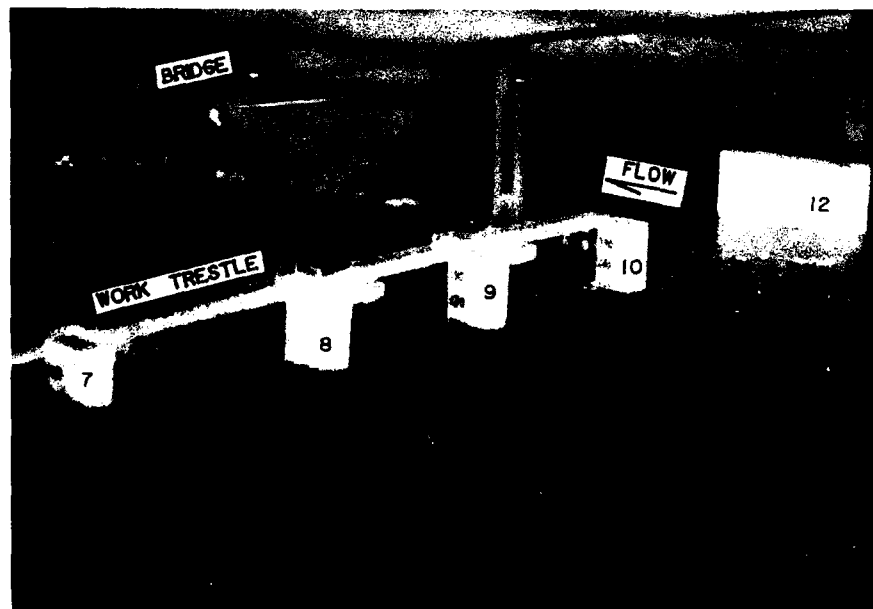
The model for Test 1 on 22 March 1979 looking downstream from Illinois side. Note local scour around cofferdams at piers 8-10
